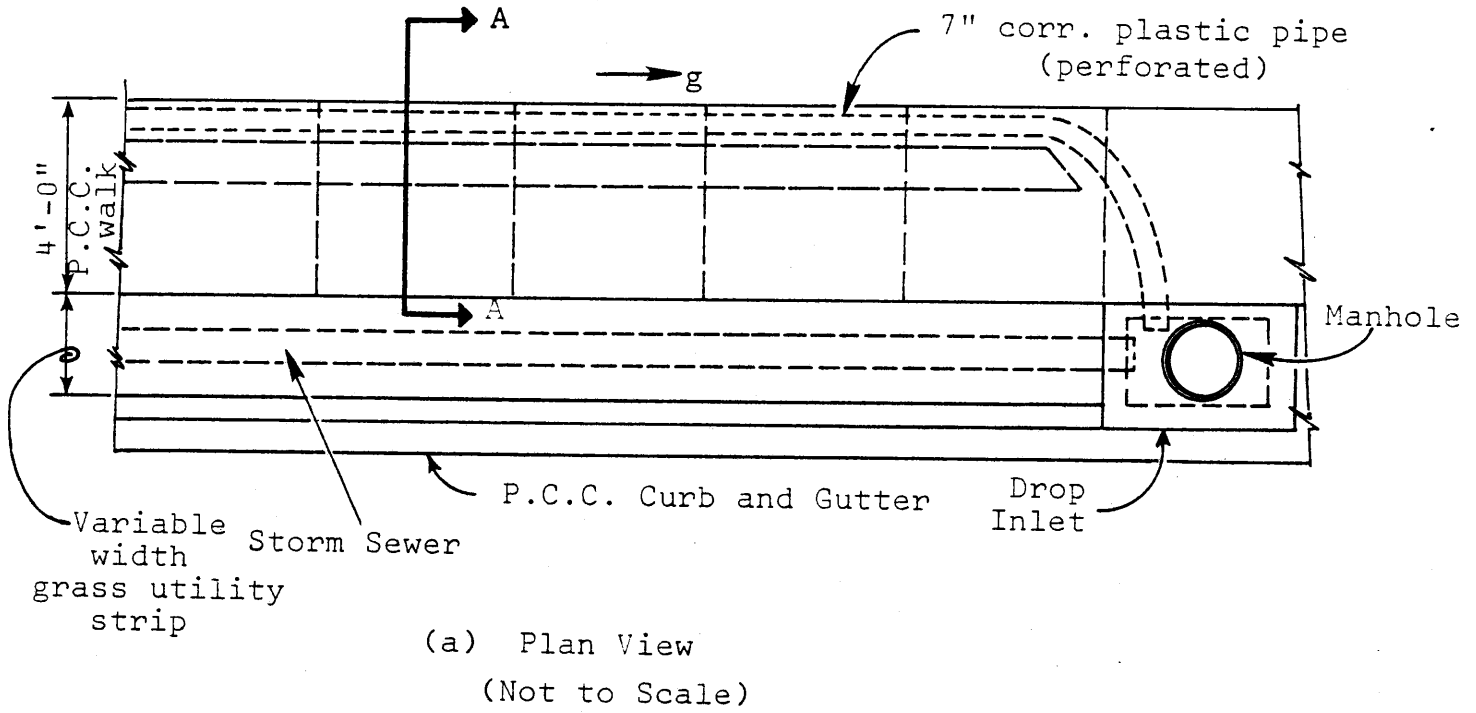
Sidewalk reconstruction with curtain wall and drainage system. (1 in. = 25.4 mm)
